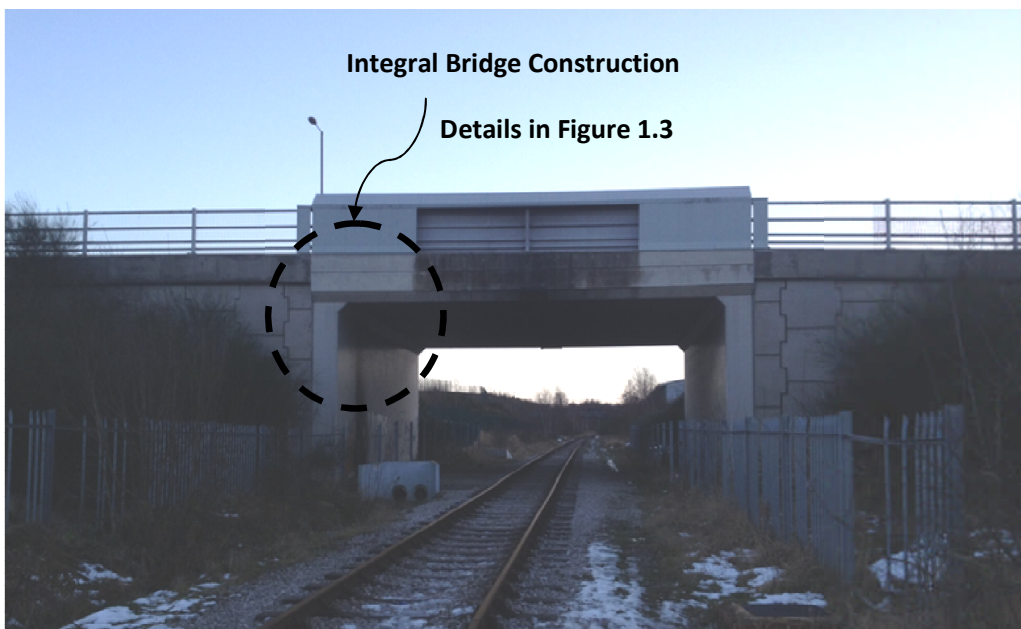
Single span integral bridge in service located in Middleton, Leeds (John Charles Approach Road Bridge over railway line), United Kingdom.
